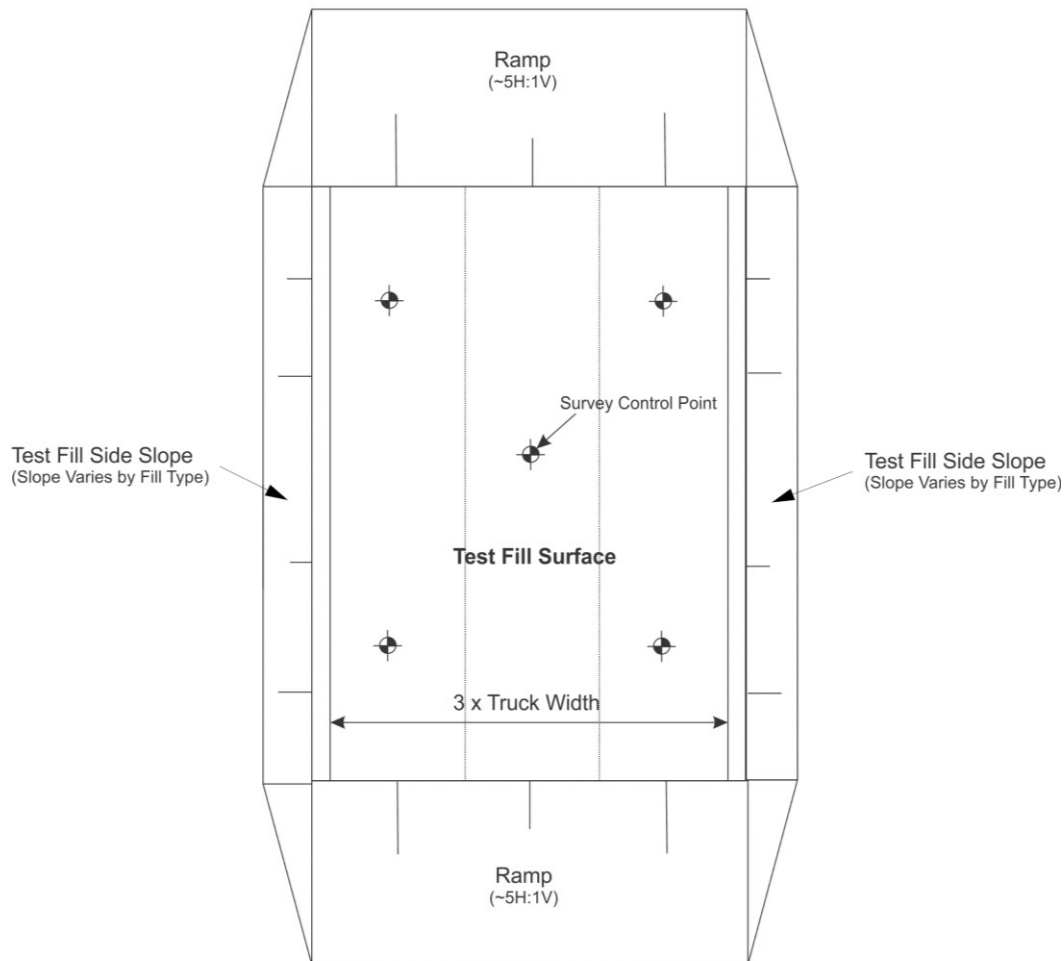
Test Fill Layout (after Breitenbach, 1993)
